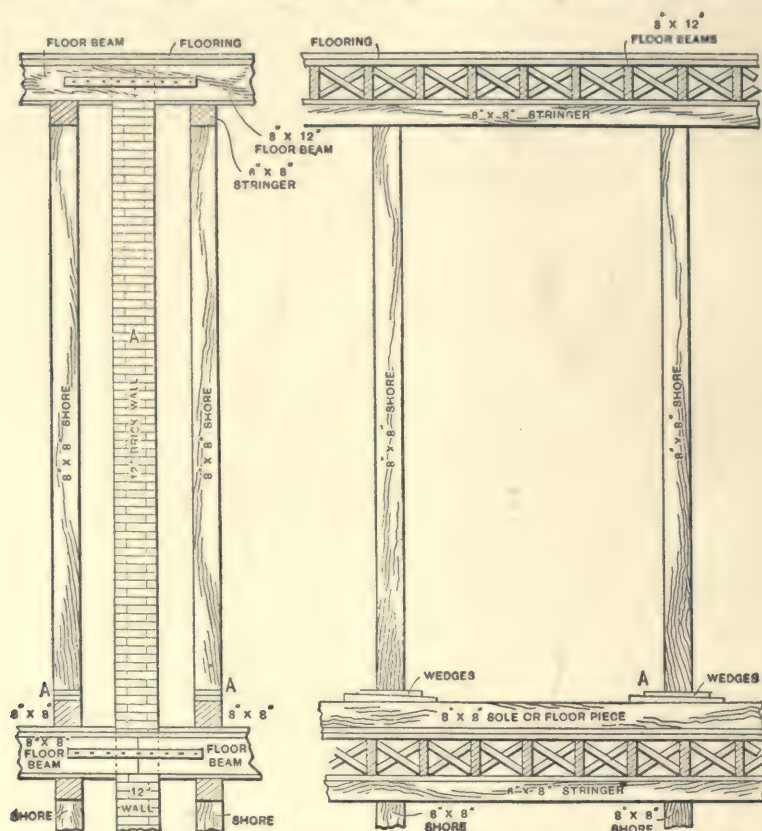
Showing the Manner of Supporting Floors and the Use of Wooden Wedges.
